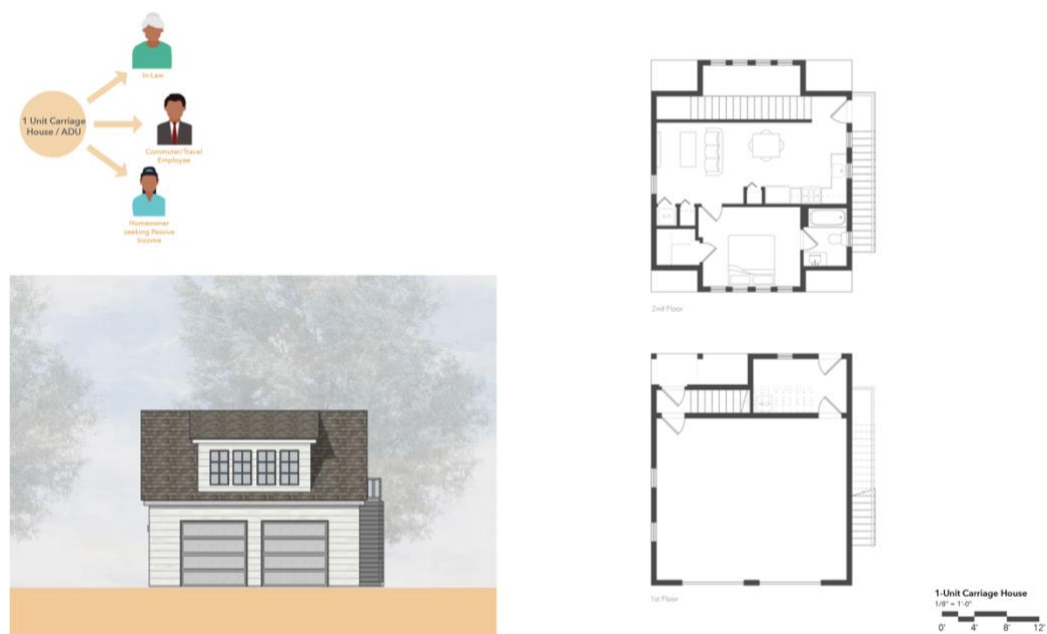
Possible One-Unit Carriage House Configuration (Source: Author)
